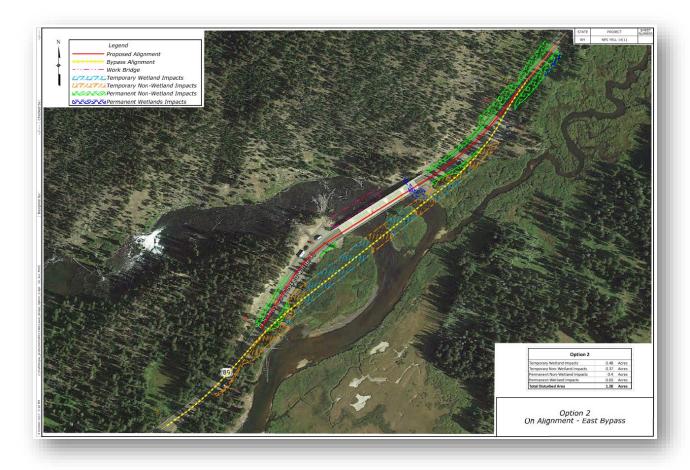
Replace bridge on existing alignment, with temporary bypass bridge to east.
